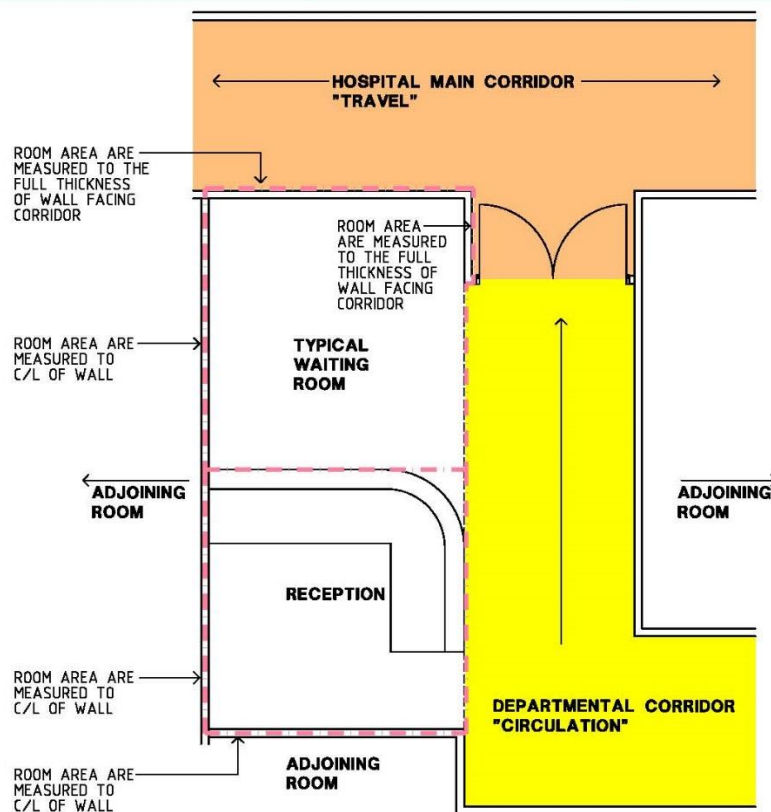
Typical Room adjoining Circulation and Travel Corridors
